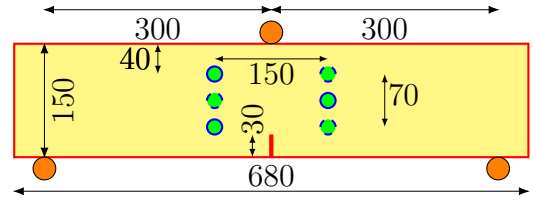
Specimen geometry with AE sensor positions (All dimensions are in mm)
